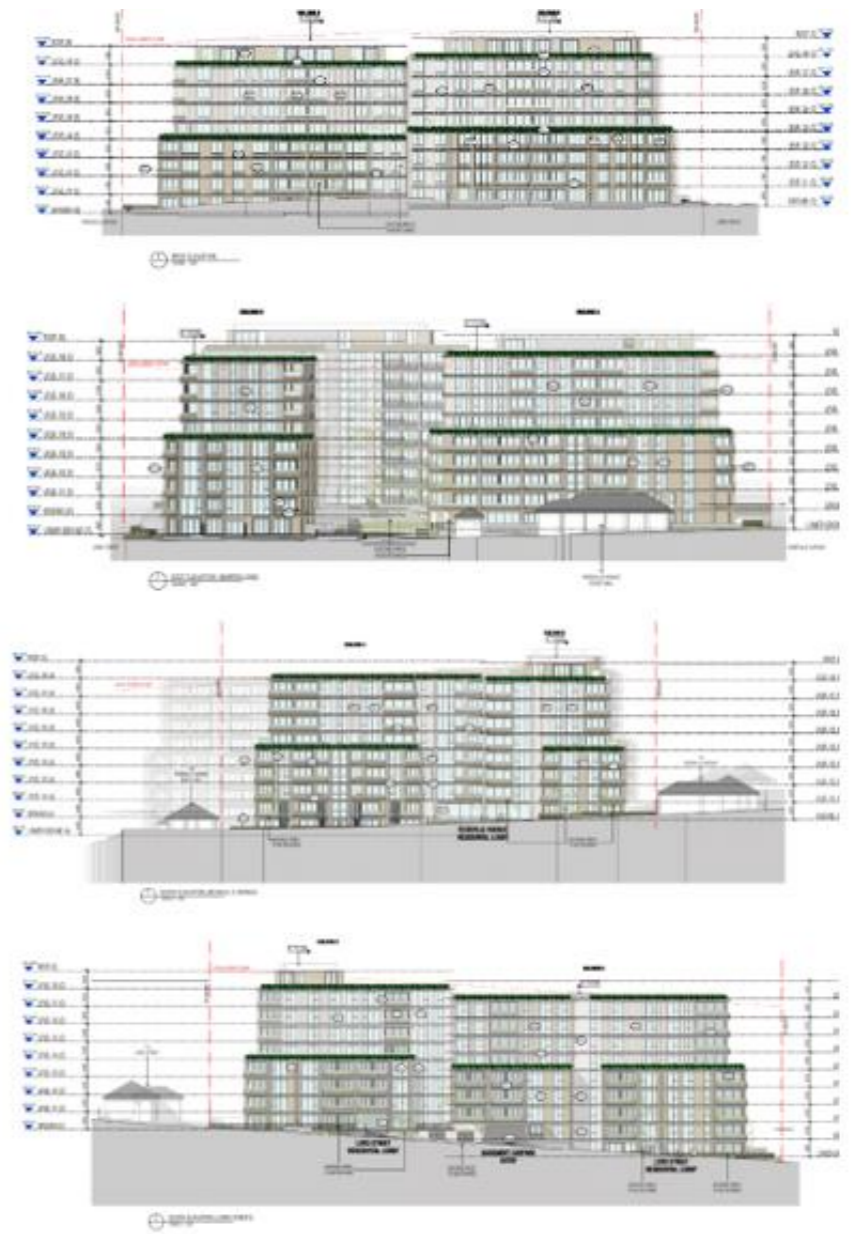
From the top: North, south, east and west elevations. Source: FKAUSTRALIA
